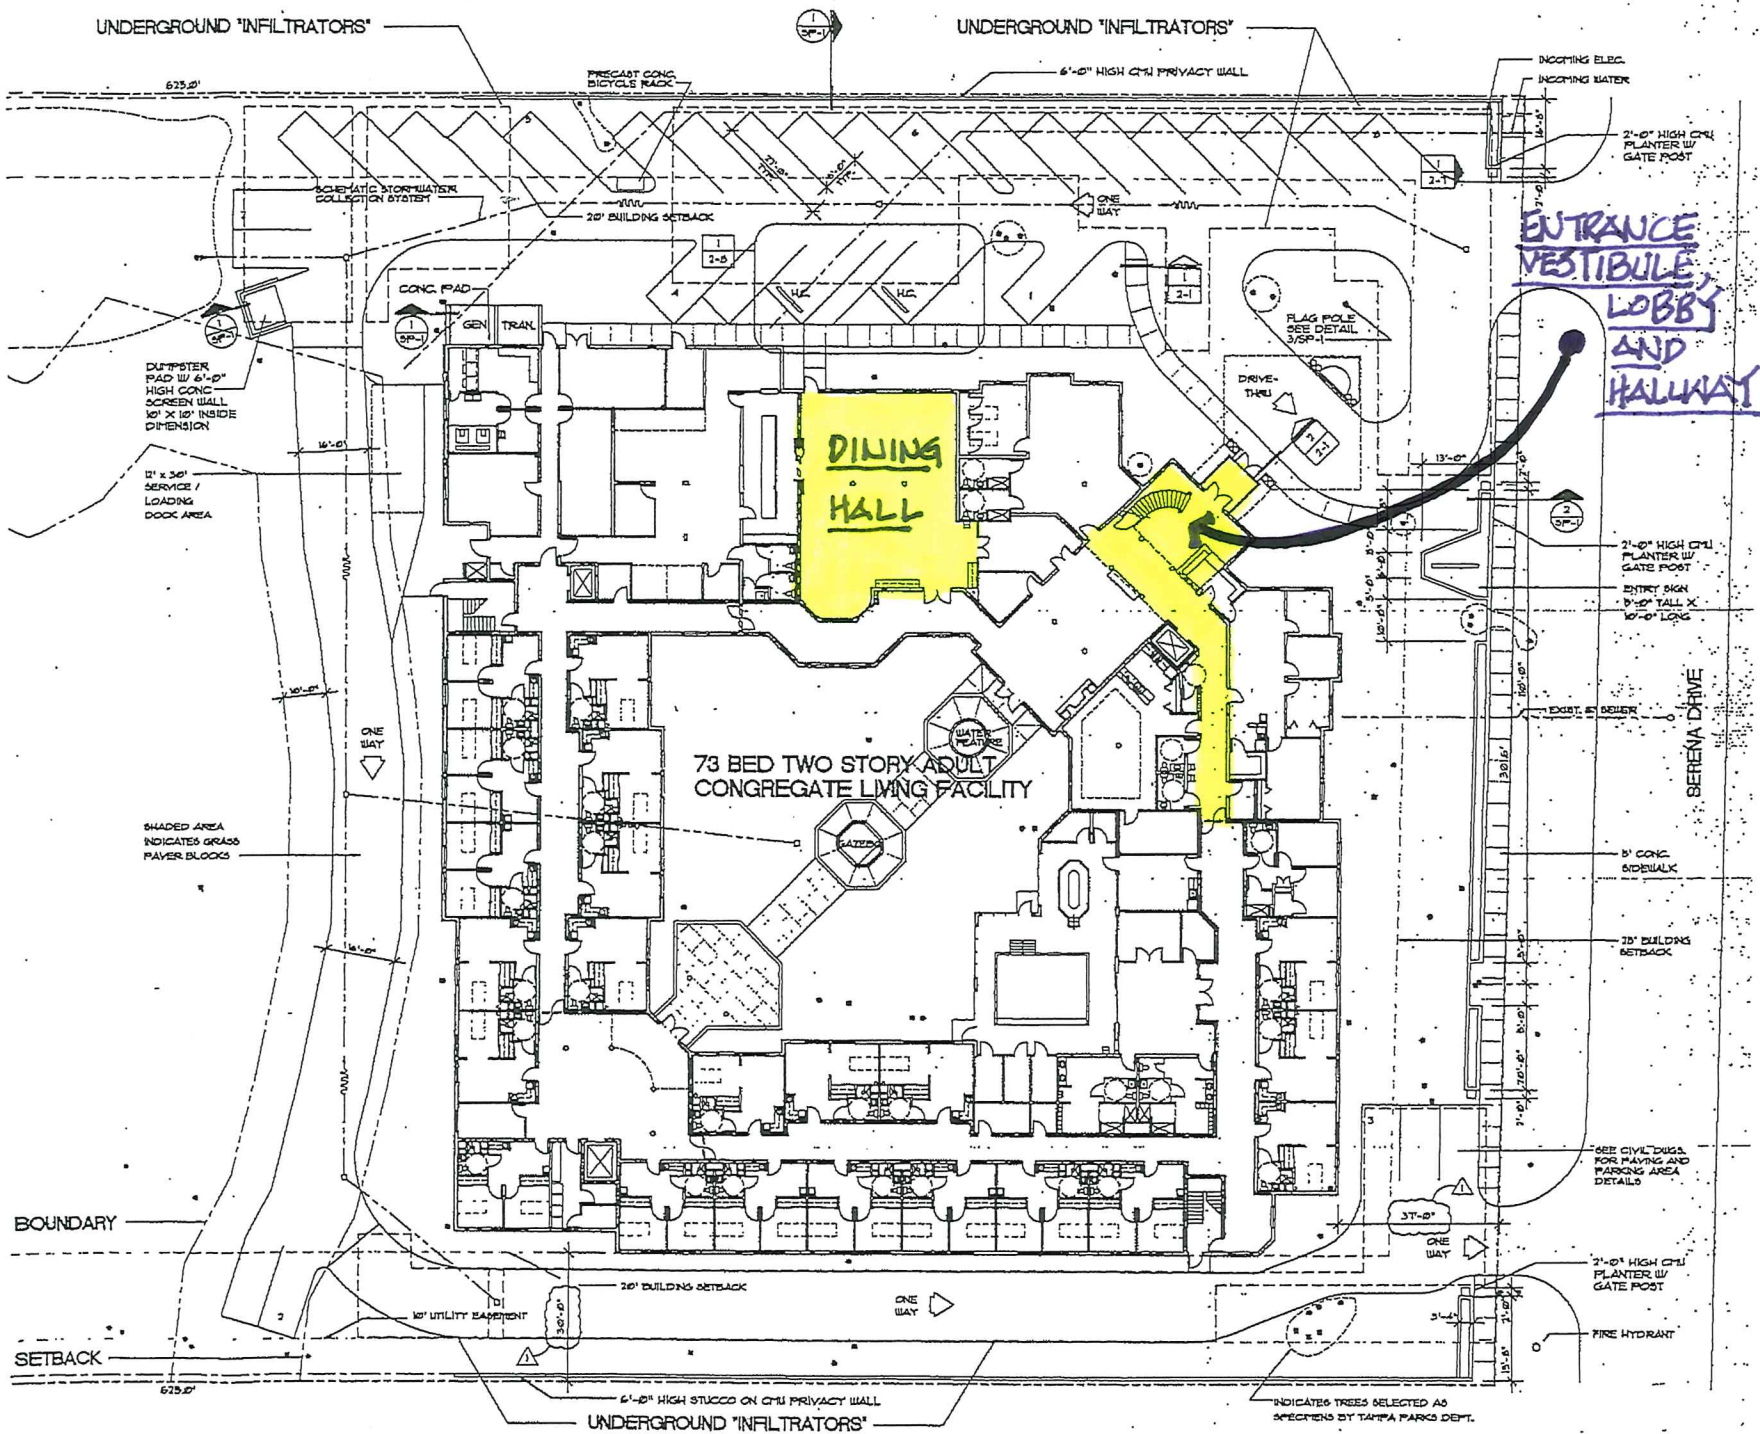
EXHIBIT "C" - ENTRANCE VESTIBULE, LOBBY, HALLWAY + DINING HALL
